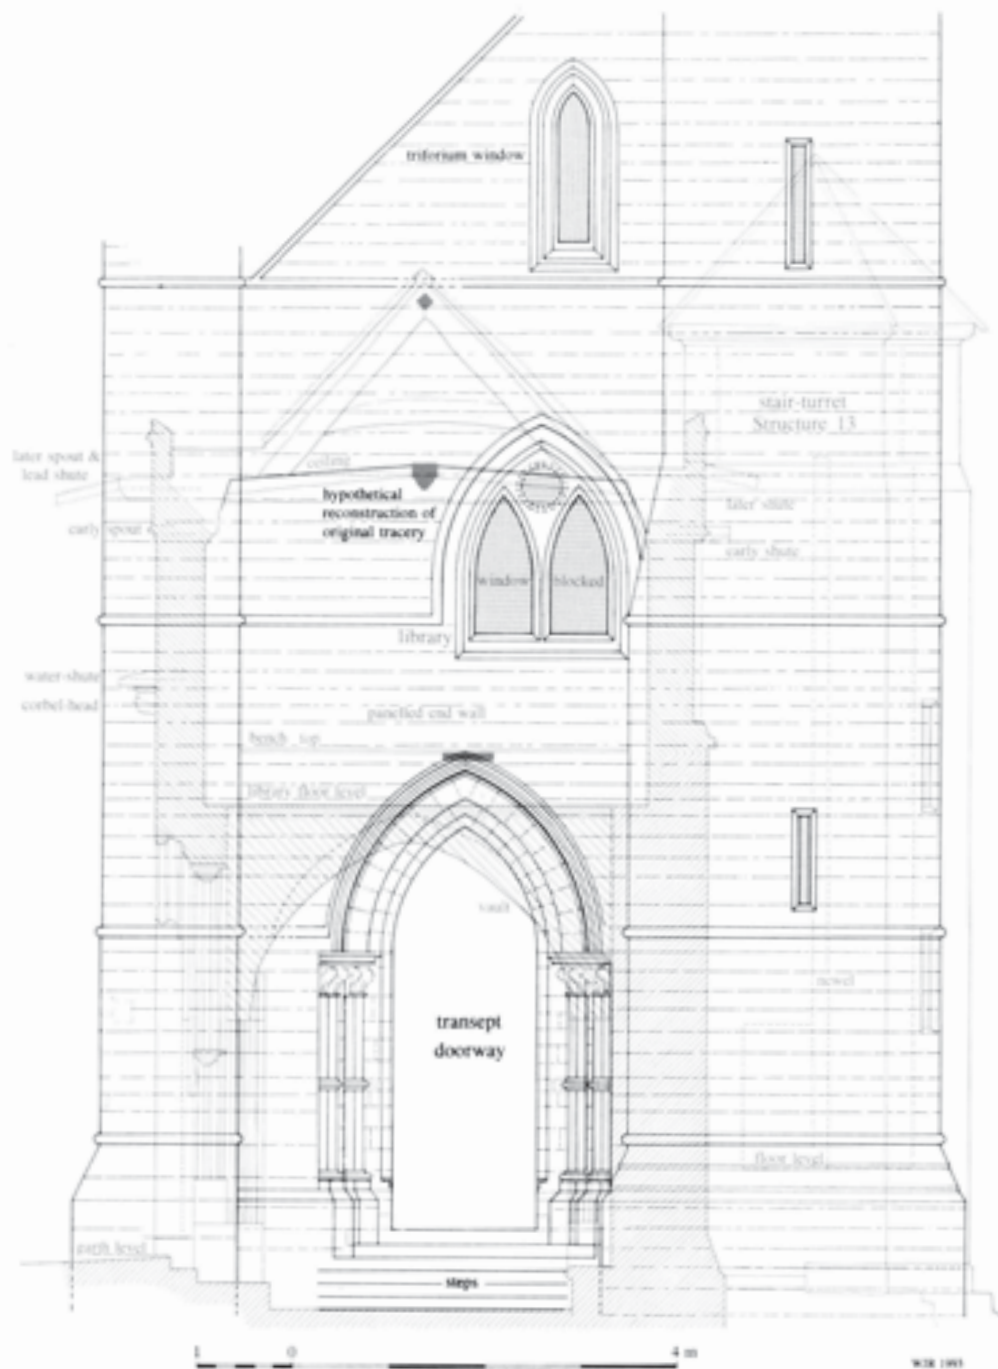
Sectional elevation showing the abutment of the rebuilt east walk and library of the 1420s (in red) against the south transept. The south elevation of the associated stair-turret (Structure 13, right) is shown, the interior and stair newel being indicated with broken lines. Scale 1:80
